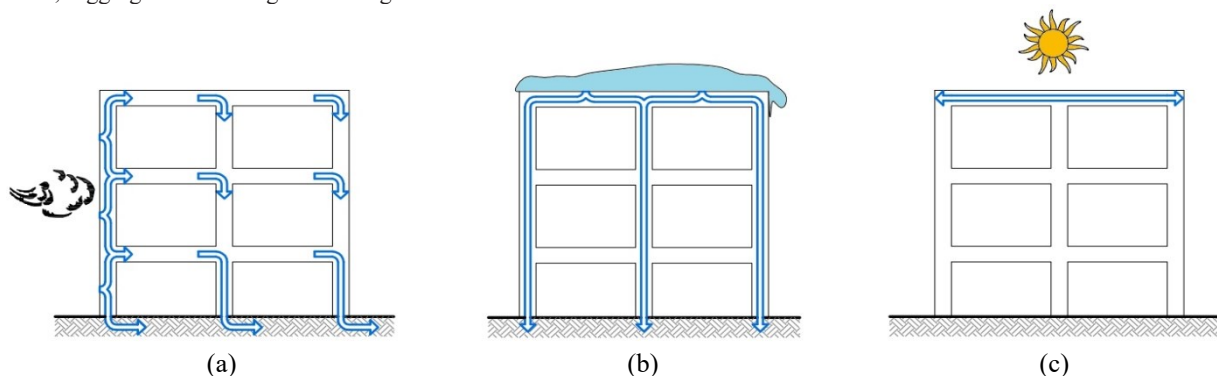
Climatic actions affecting buildings, a) wind, transmitted horizontally to the foundations through bracing which ensures structural stability, b) snow, water, transported by gravity from top to bottom through bending or compression of floors, beams, columns and walls, c) uniform temperature distribution
